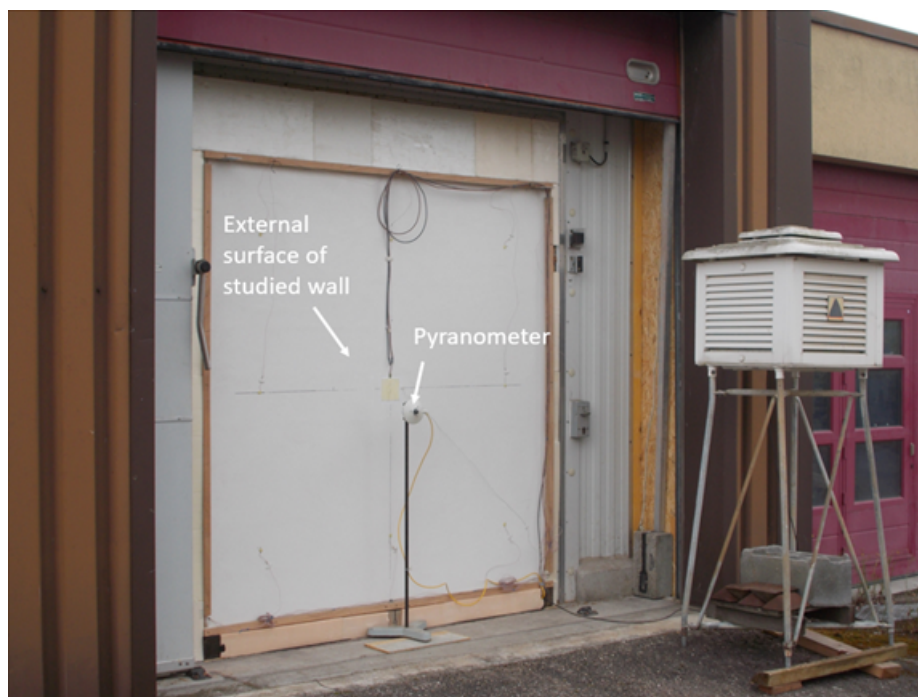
Exterior view of studied wall when testing under natural condition at CEREMA.
